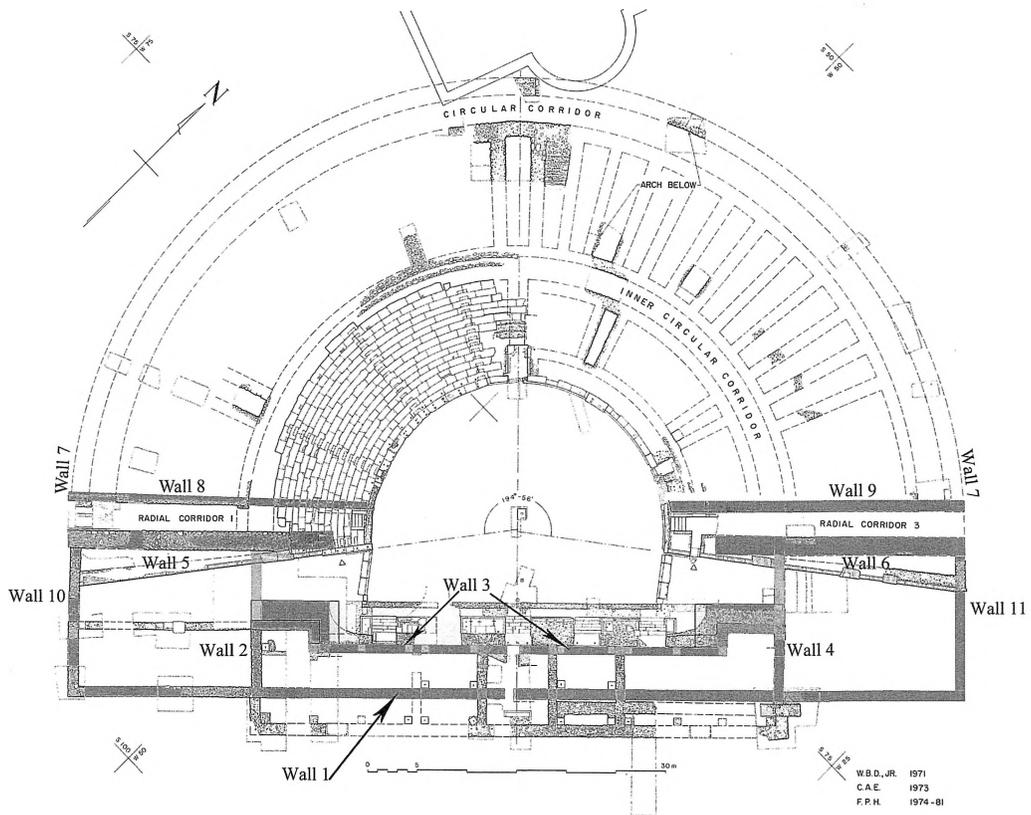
Actual state plan with walls of the first theater numbered and outlined in dark grey. (10/2010; Peggy Sanders PDF)
